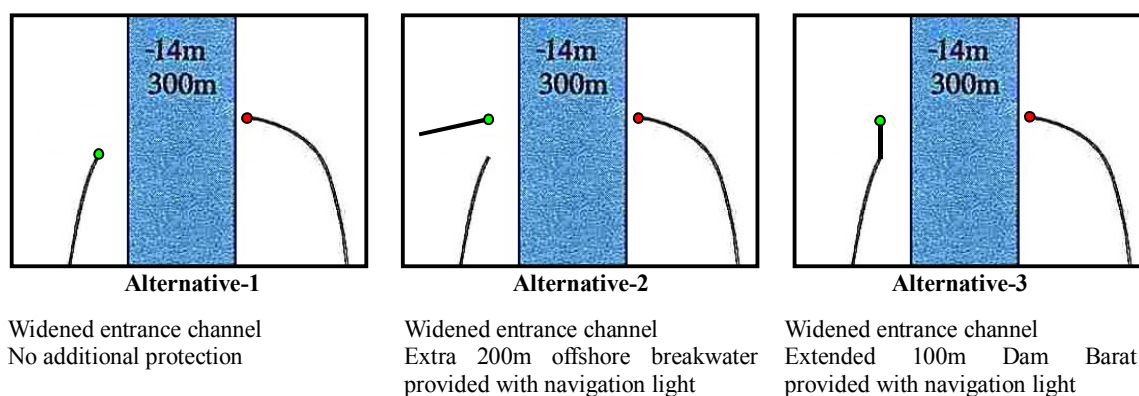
Alternative Breakwater Configurations at the tip of Dam Barat
